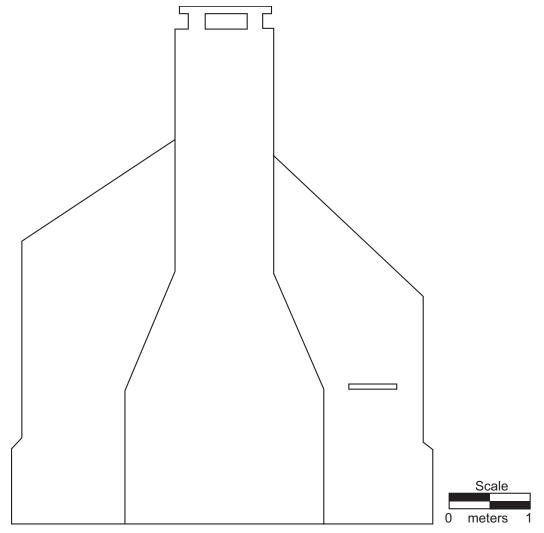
Elevation of northwest exterior side of stone structure at Rancho El Saladito.
